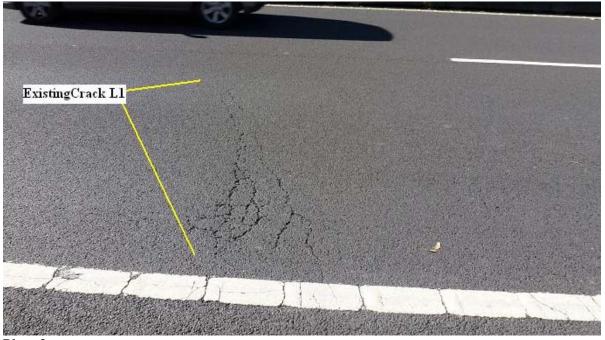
View east at SM 24 on 22-5-12 showing existing pavement cracking in Lane 1 NB
